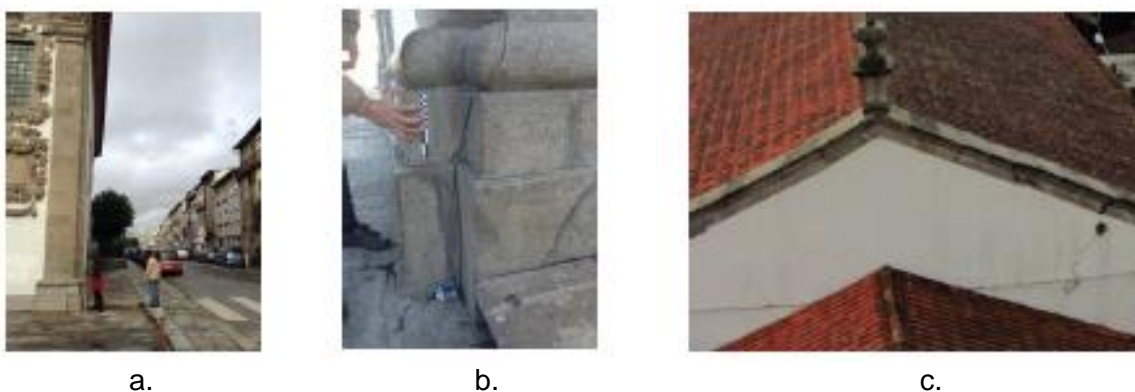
Damages observed on the facade: a. Tilting of the south side wall; b. Cracks in the corner; c. Cracks in the back wall (Betzer et al., 2014).
